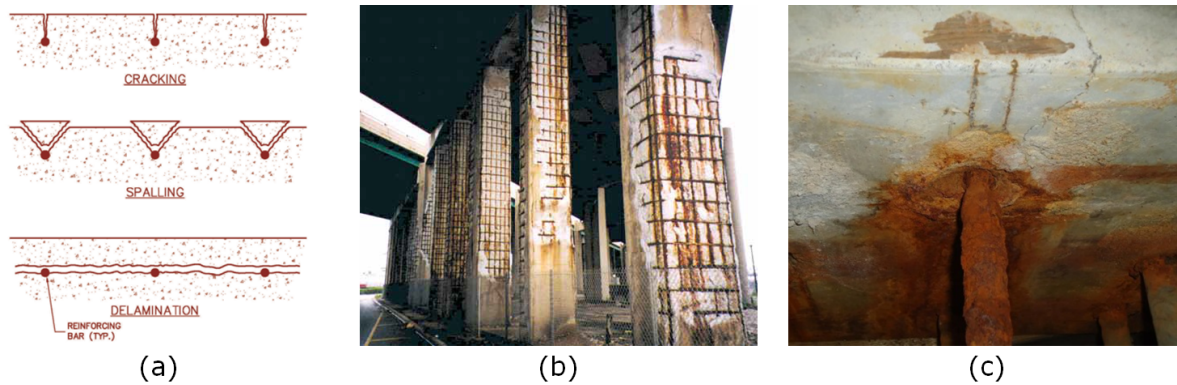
Failure mechanisms on concrete structures: (a) a schematic presentation (Banville, 2008: 2), (b) spalling of concrete due to a chloride attack of embedded reinforcement (Banville, 2008: 2), (c) rebar corrosion with visible cracking of concrete.
